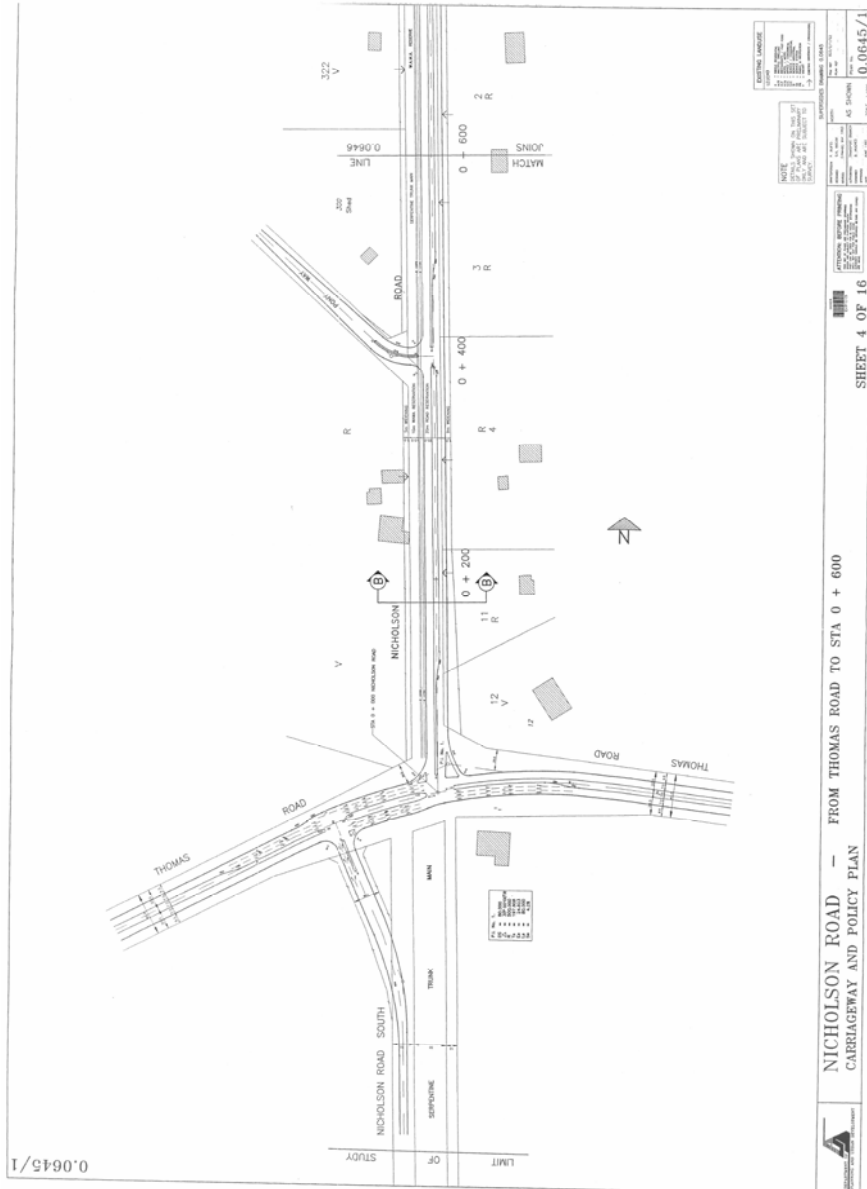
ULTIMATE PLAN THOMAS ROAD
